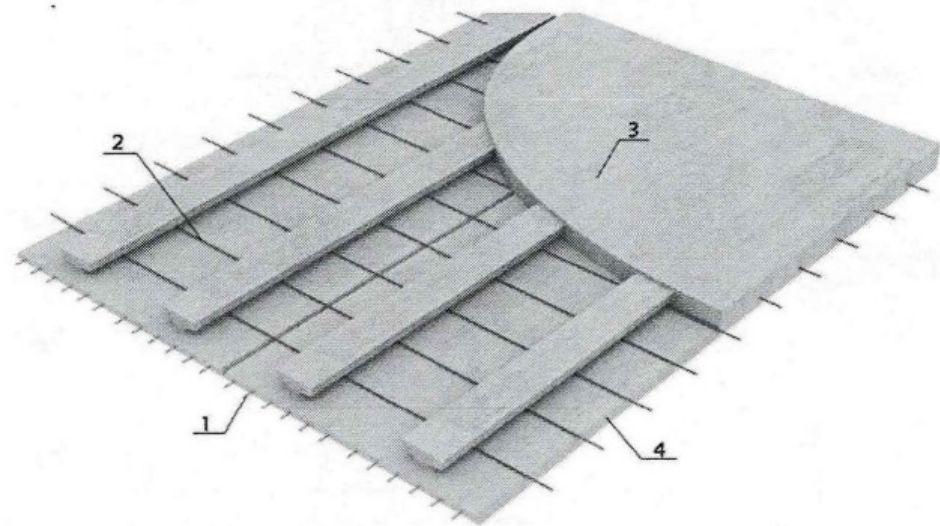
Prefabricated ribbed floor concrete composite floor slab. Note: 1—longitudinal prestressed steel bars; 2—transverse perforated steel bars; 3—post-cast layer; 4—precast base slab of pk composite panel.
